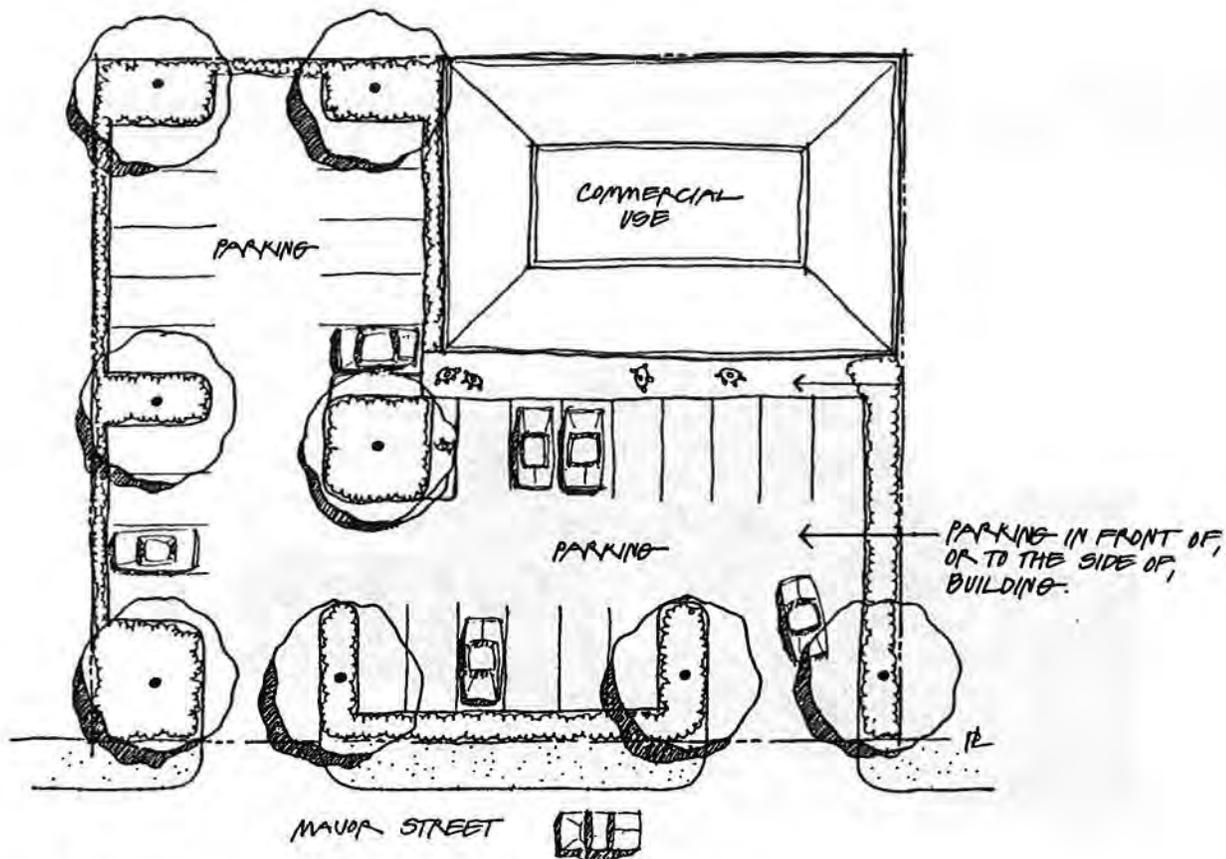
TYPICAL HAIKU ON SITE PARKING
